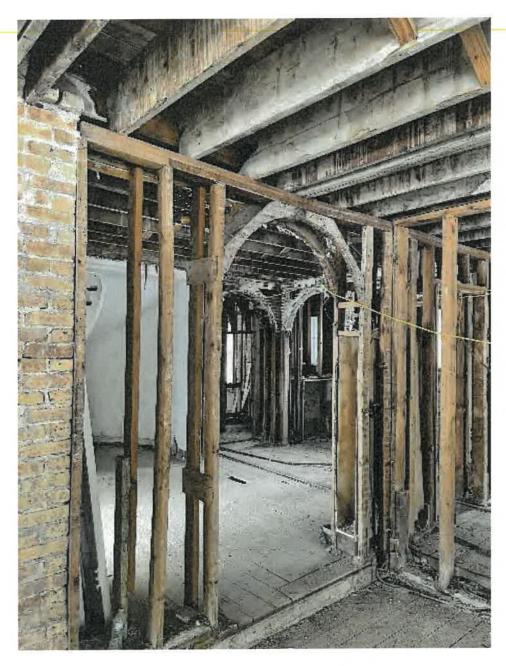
South Wing (First Floor) – Floor framing second floor bouncy with too much deflection. Wood framed bearing wall lacking header at door opening and joist ends. Structural reinforcement required. Efflorescence at brick wall and evidence of moisture damage at wood framing members bearing on masonry. In the upper left corner of the photo, the wood framing member that is typically pocketed into the masonry is exposed and illustrates the concern about susceptibility of wood decay where wood framing is pocketed into masonry.
